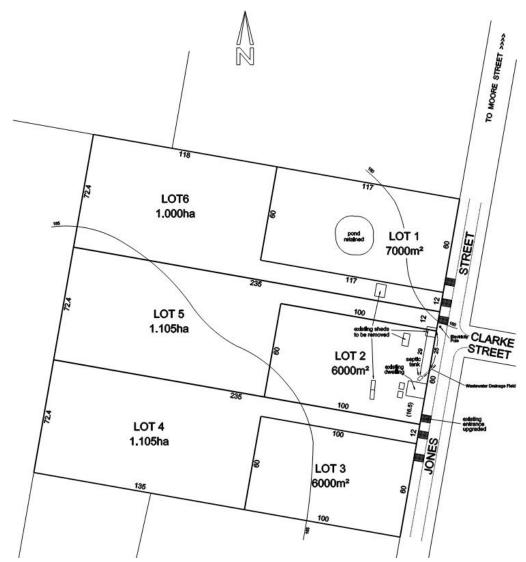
Extracted Plan of Subdivision (source: Application documents).
